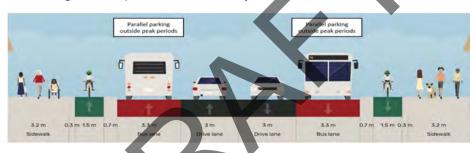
Option 2 - Hutt Road Indicative Plan and Cross Section
